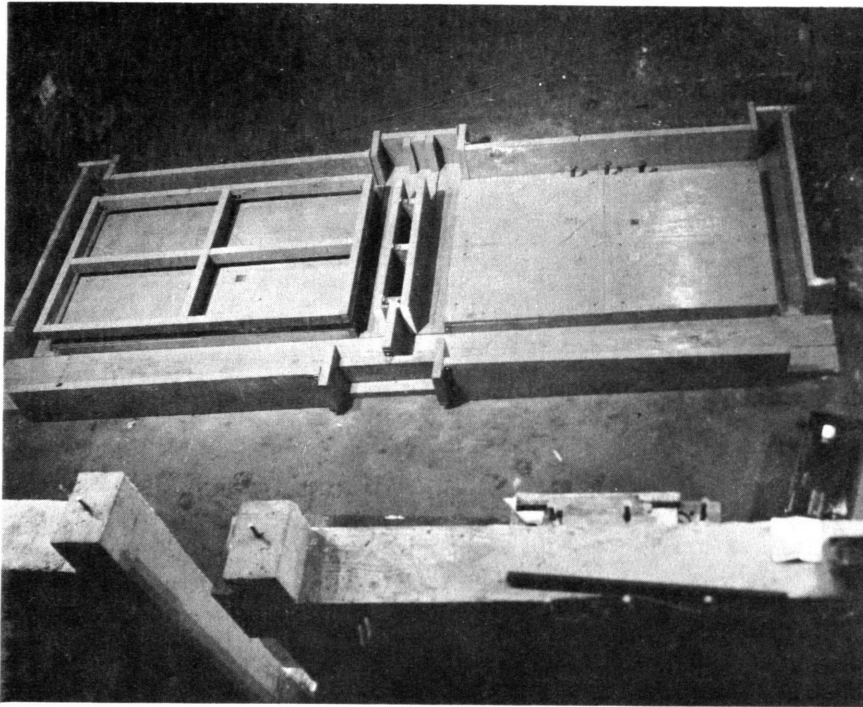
Formwork and Reinforcement in Place for the Shear Wall Specimen
